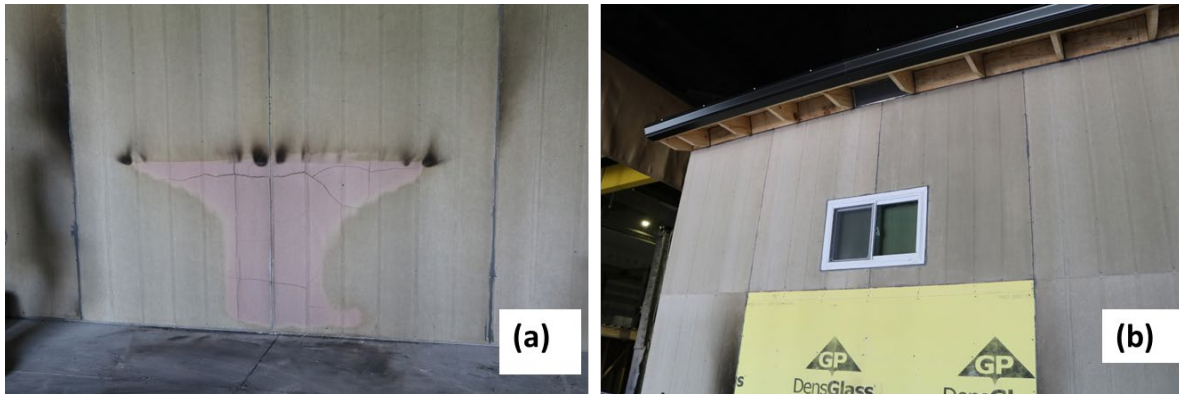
Photographs of target structure showing (a) cracking of cement board due to thermal exposure and (b) undamaged window and eaves in test 1B-SCh0-0.
